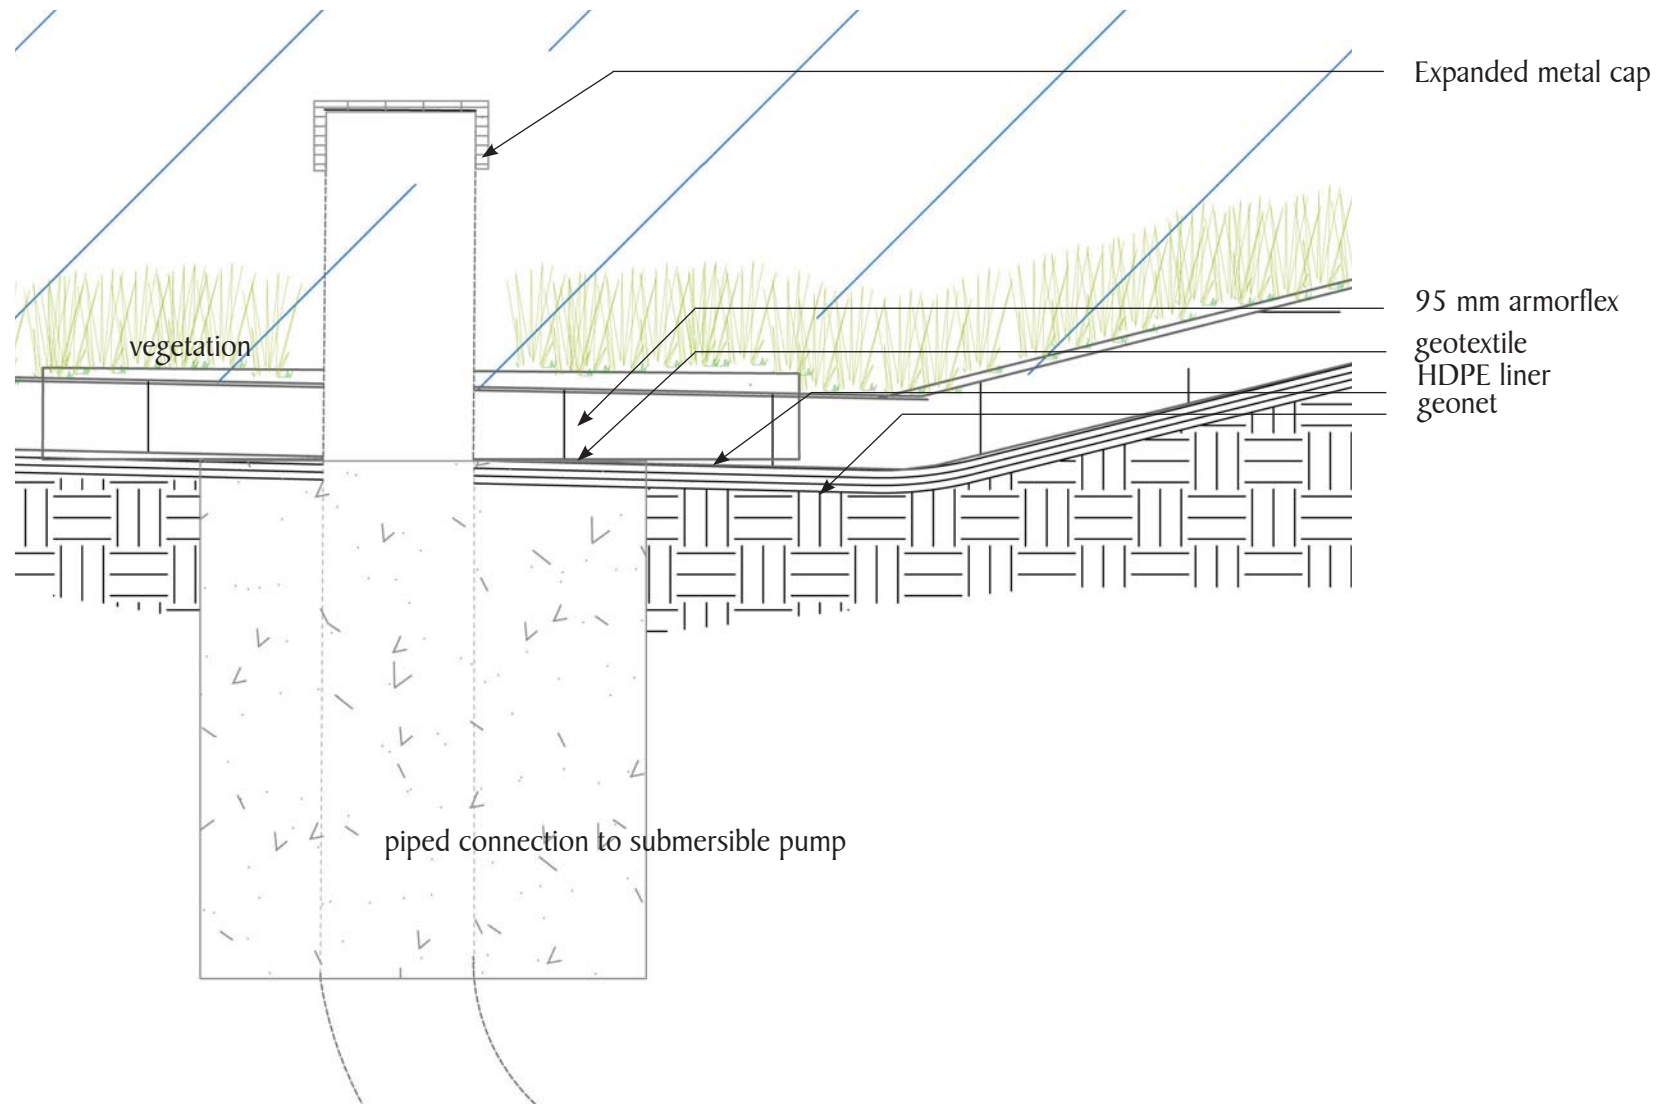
Section through dam linings Scale 1:10 (Author, 2008)
